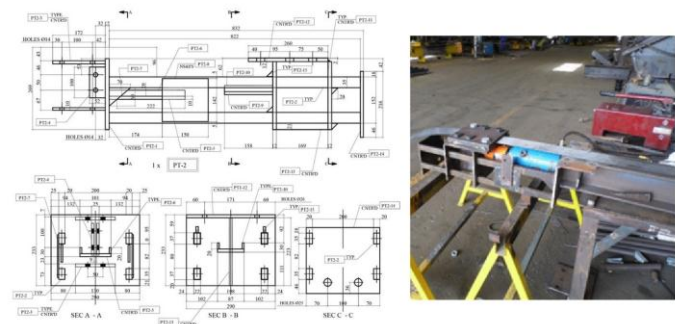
Test sample preparation and applying the prestressing force / prestressing tool detail
